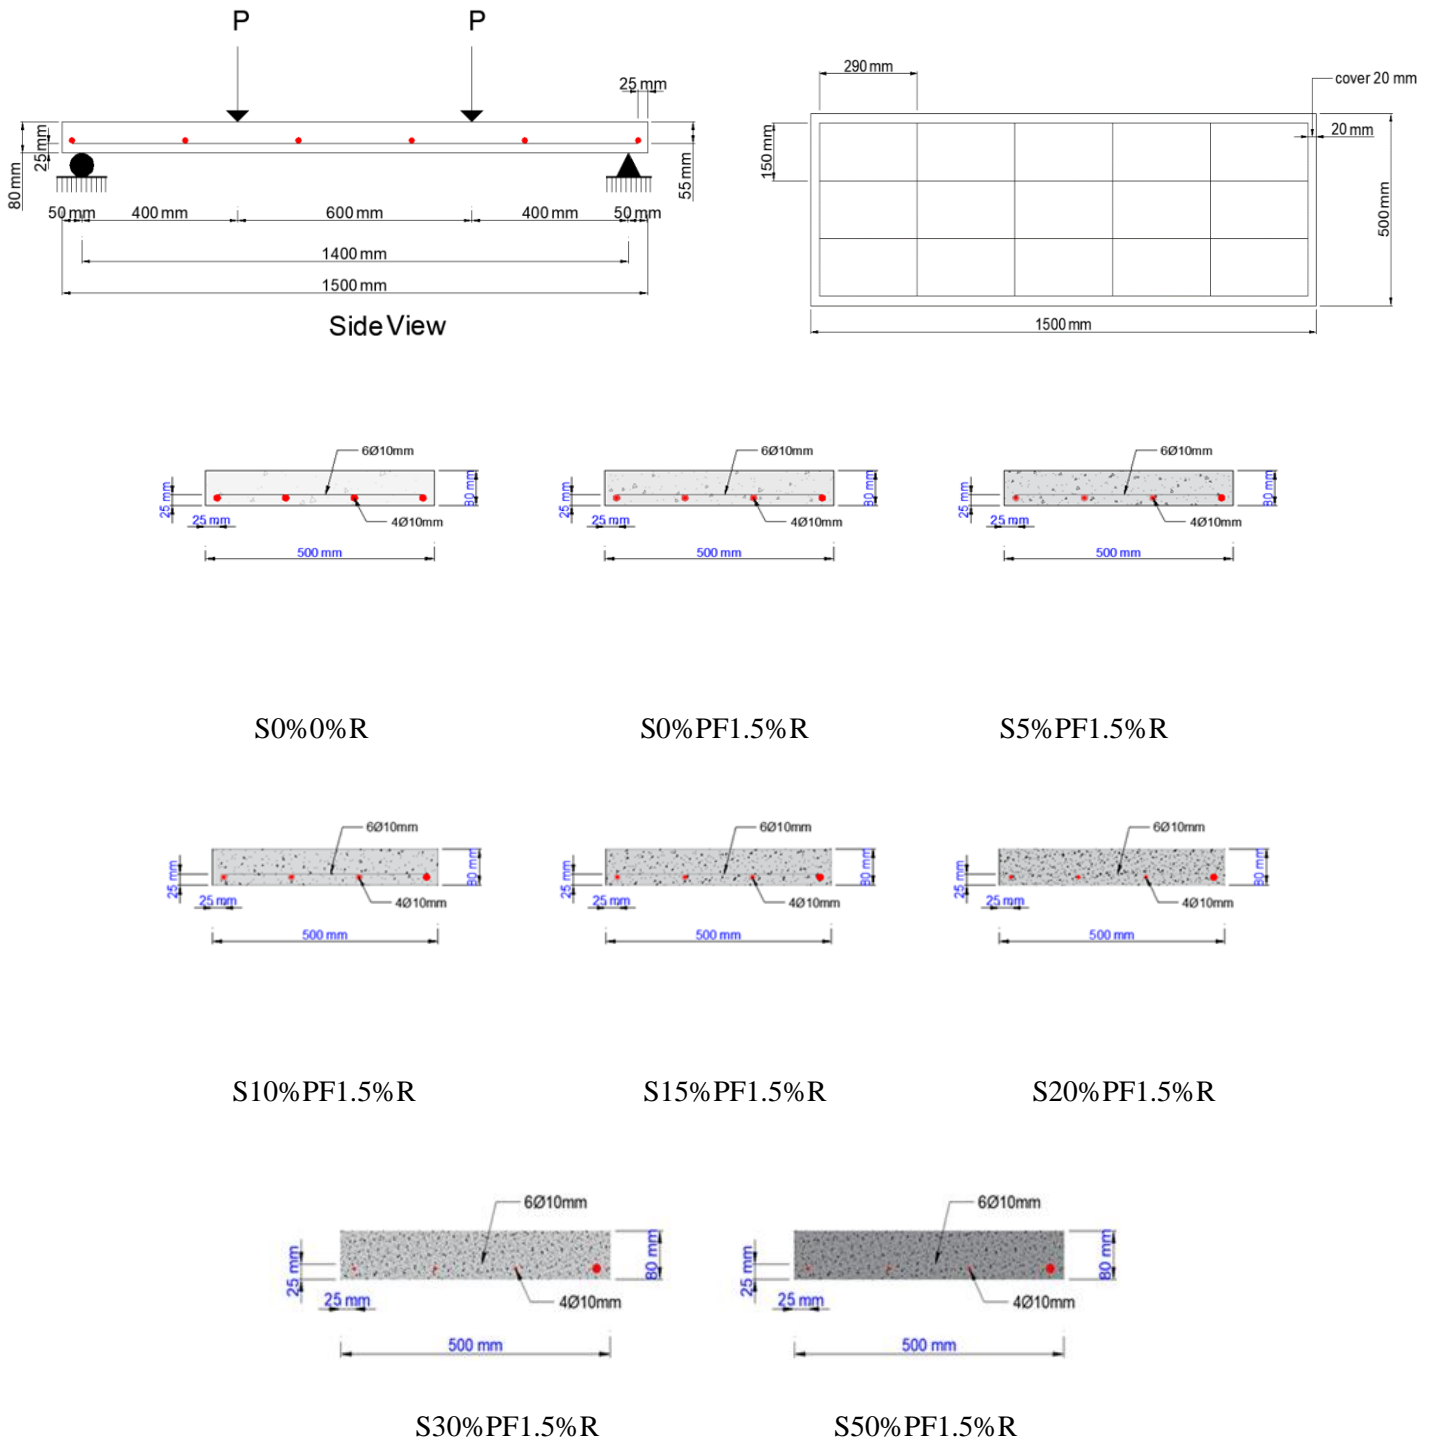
The Details of Reinforcement Concrete Slabs.
